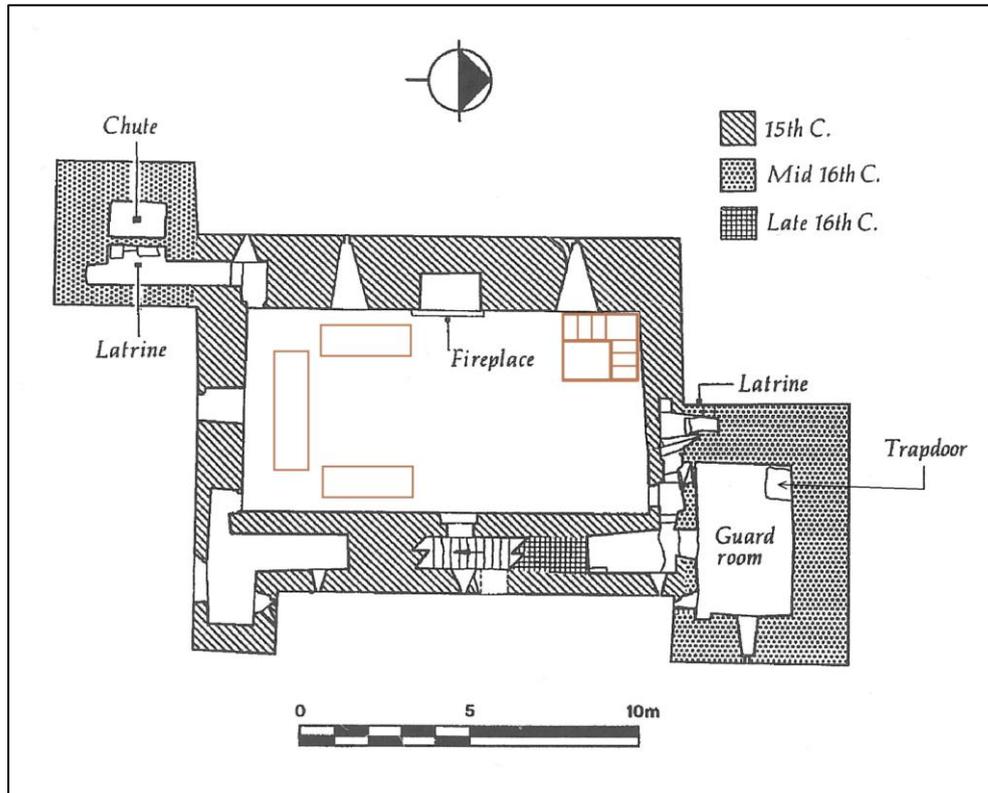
Plan view of first floor in Barryscourt Tower House - Adjusted sketch from (Monk & Tobin, 1991)
